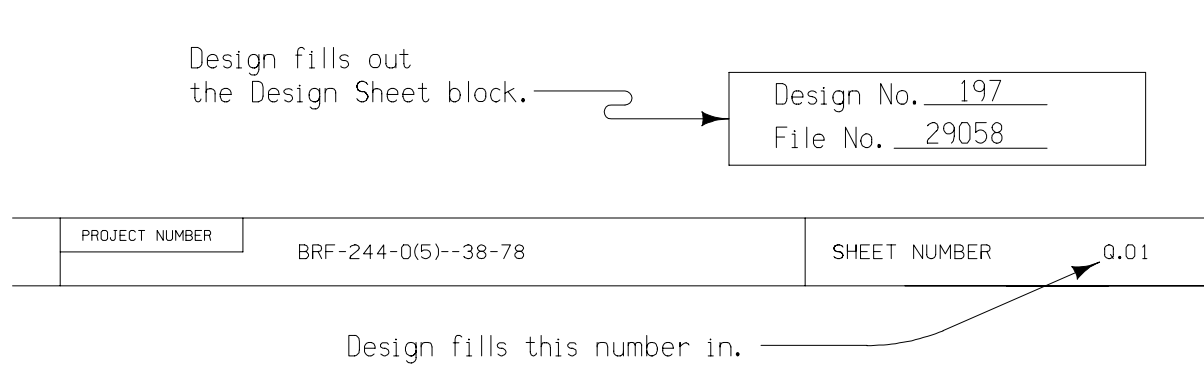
The Design Sheet block should be placed on all sheets prepared for inclusion in a bridge project.
